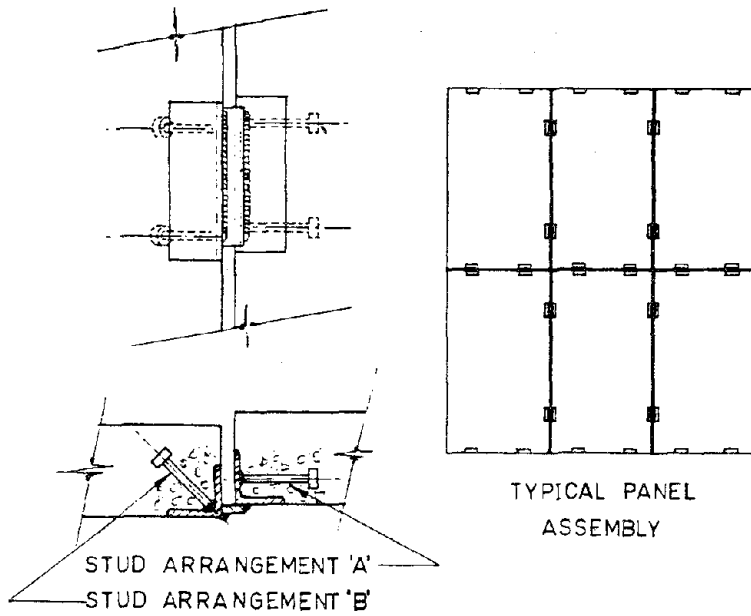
HEADED STUD WELDED CONNECTION SHOWING TYPICAL APPLICATION [5]
